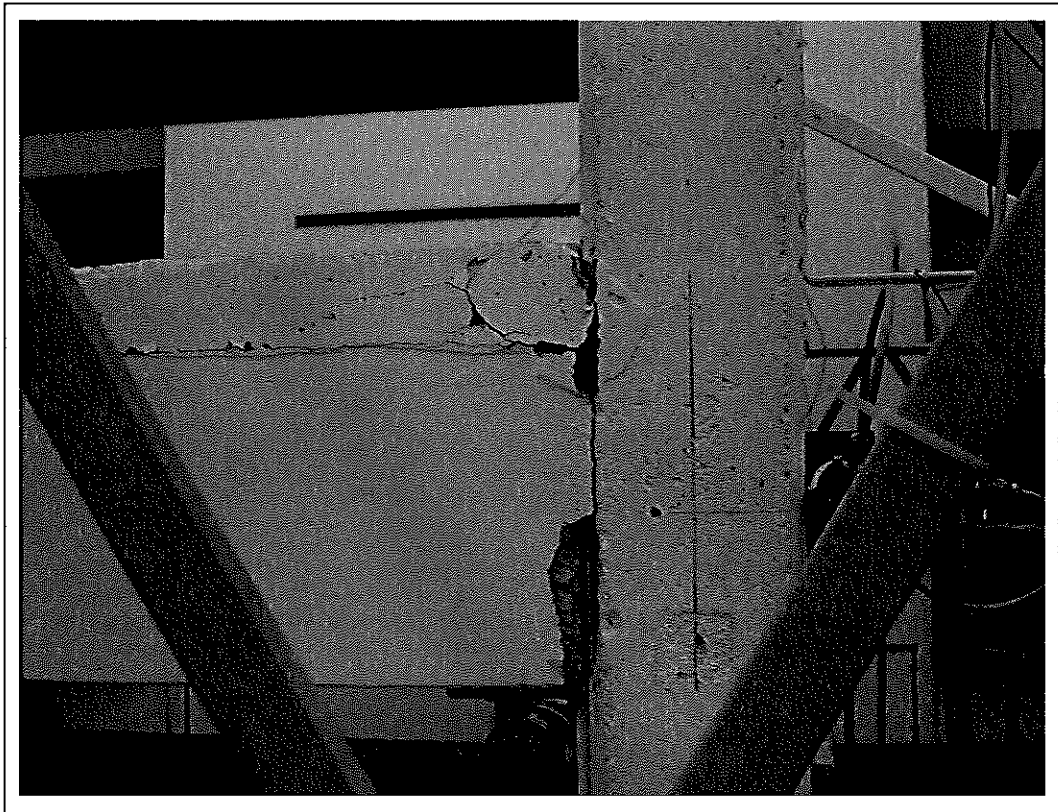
Detail of the beam-column connection after the test (J4-Trans.)
